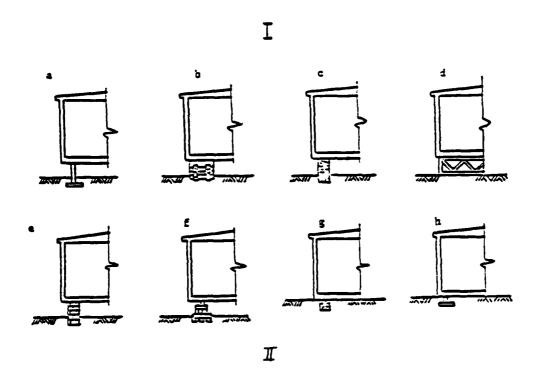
Diagram of the construction of buildings on fill: a - increased insulation inside the floor; b - ventilated cellar; c - unheated first story; d - ventilated fill made of large pore material; e - air cooling ducts; f - brine system of artificial cooling.
